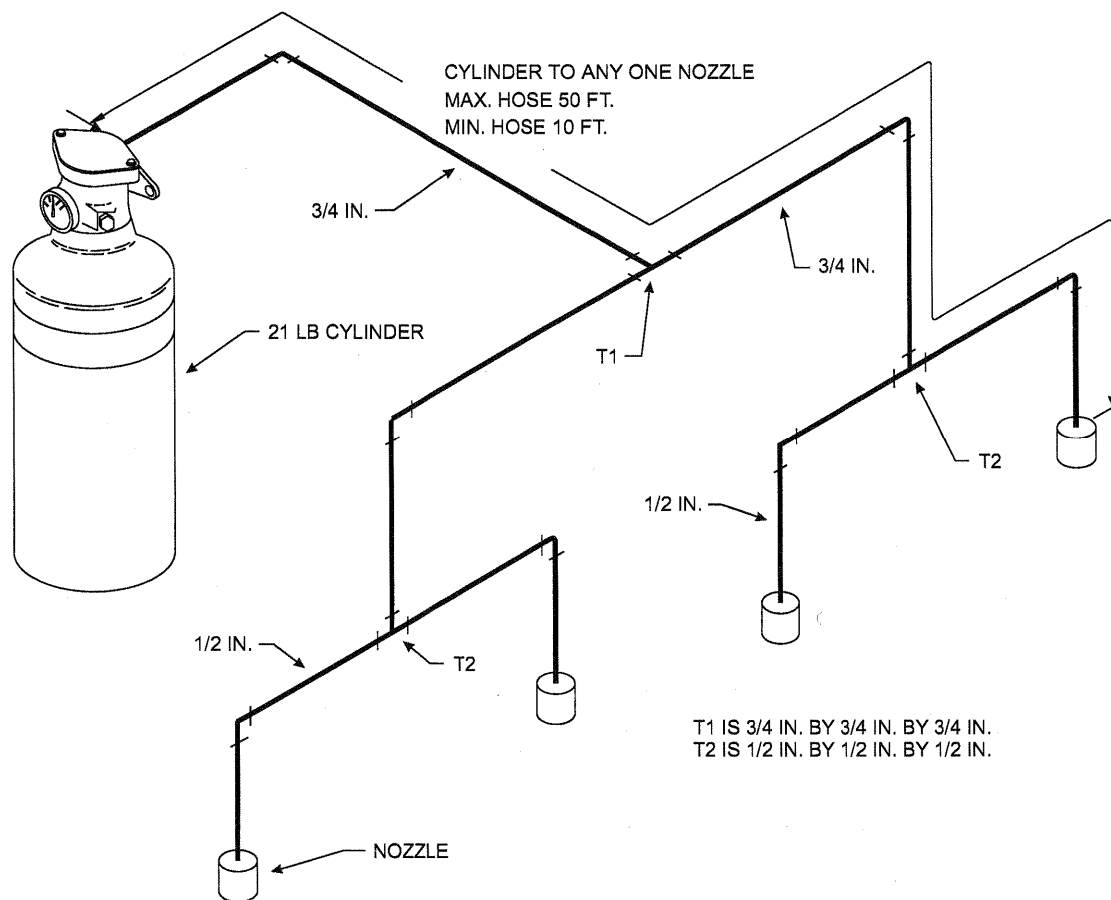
IND-21, Four-Nozzle System, Using All Tees.
